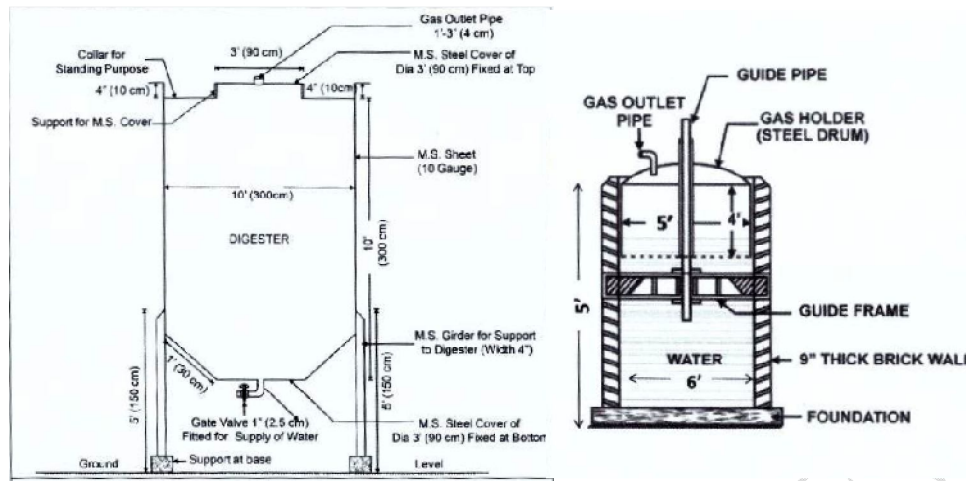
Detailed specification of PAU model batch type paddy straw biogas plant digester and gas holder
